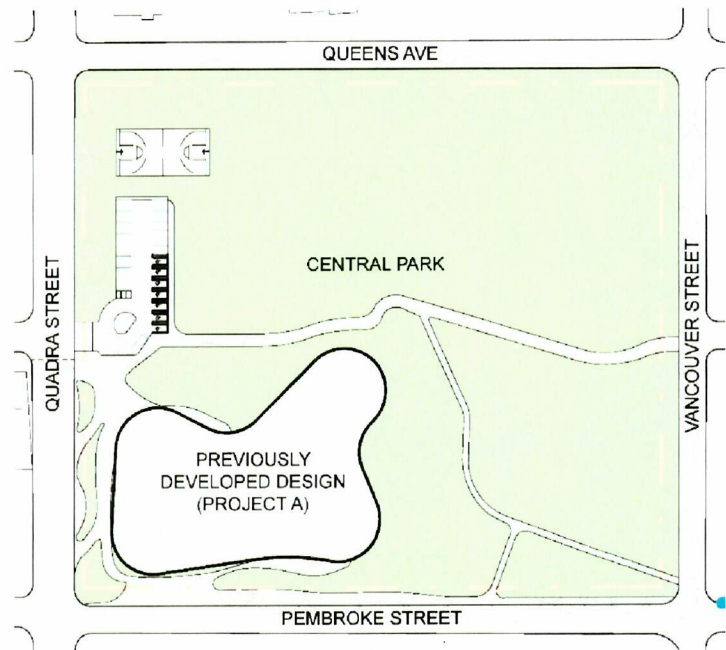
SW Corner of 2275 Quadra Street 'Project A' Site configuration
